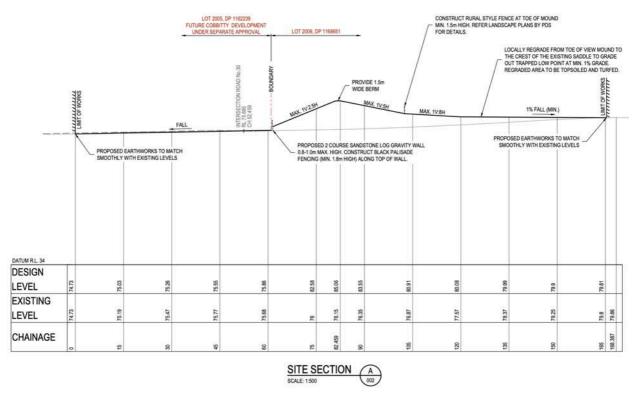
Site Section A (Plan 003, Site regrading Sections 01 of 02)
